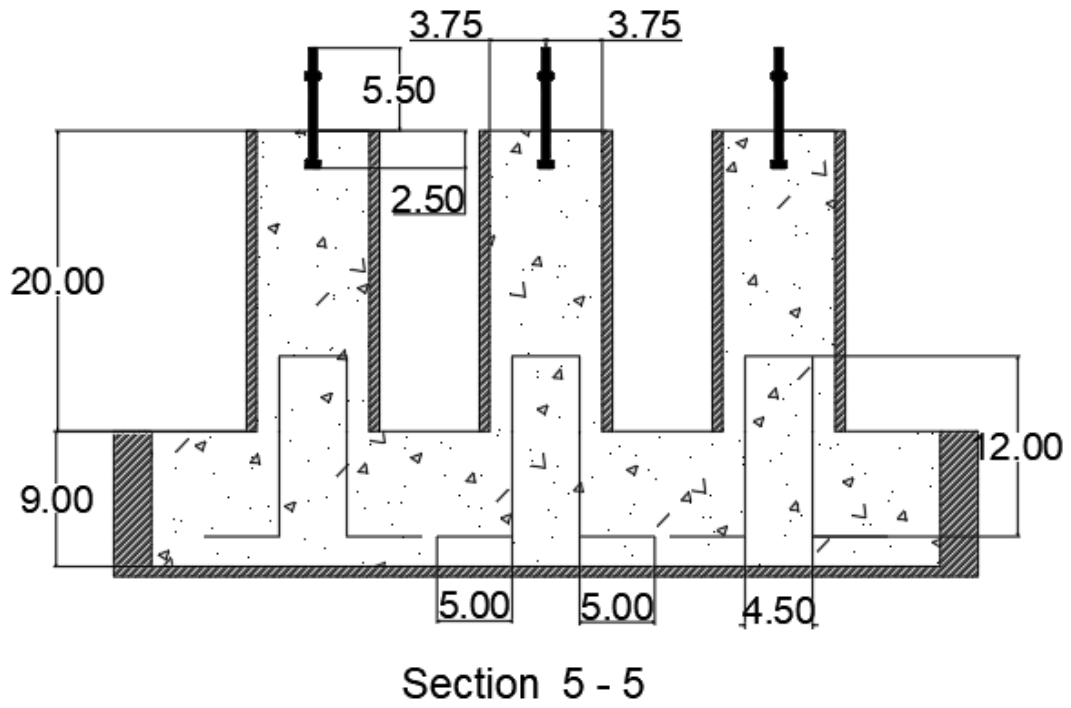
Specimen Sections (5-5), all dimensions in inch.
